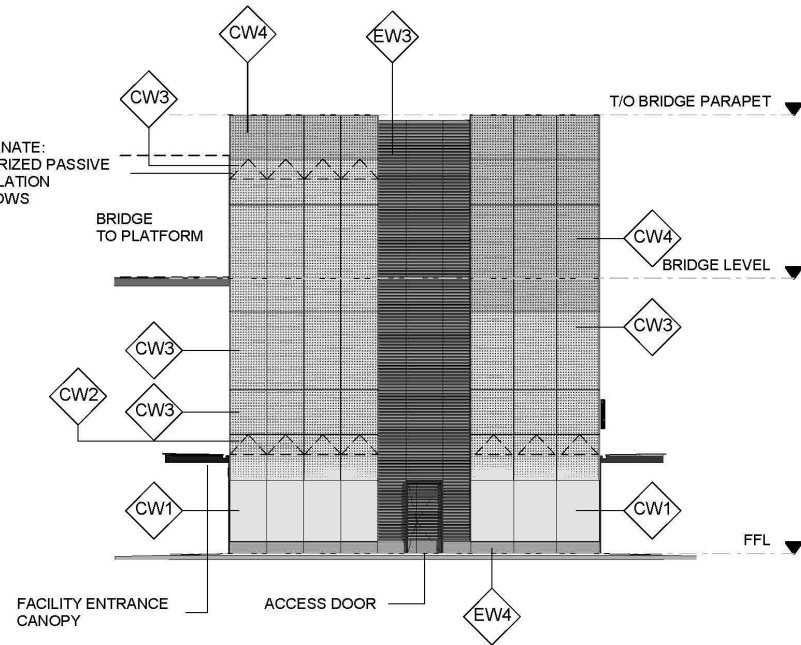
Staffed Station building (bridge platform access) side elevation of Platform Access Module
